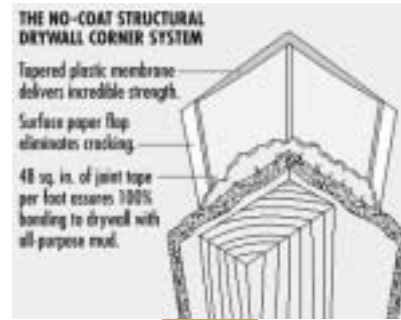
Drywall corner system. Courtesy of No-Coat.
